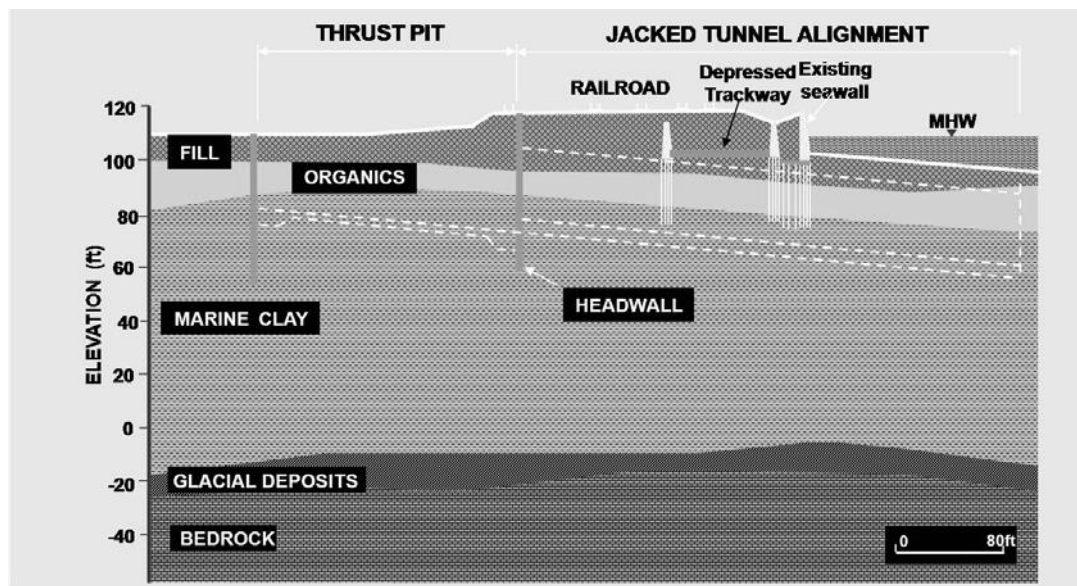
Generalized Subsurface Profile for the I-90 Jacked Box Tunnels
